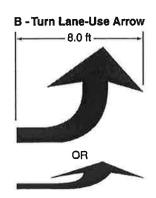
B-24. Examples of Standard Arrows for Pavement Markings
